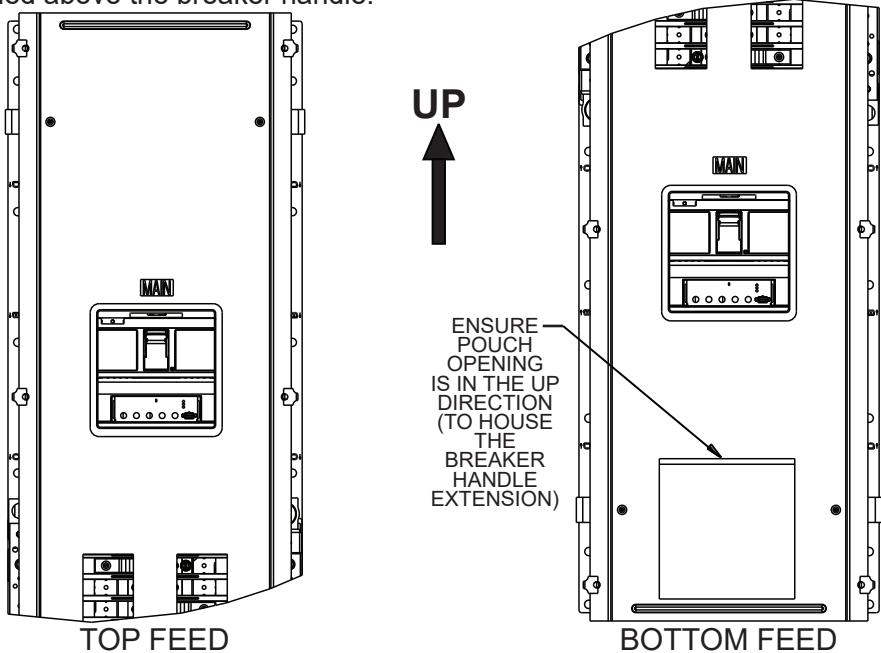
Top & Bottom Feed Deadfront Filler Installation
